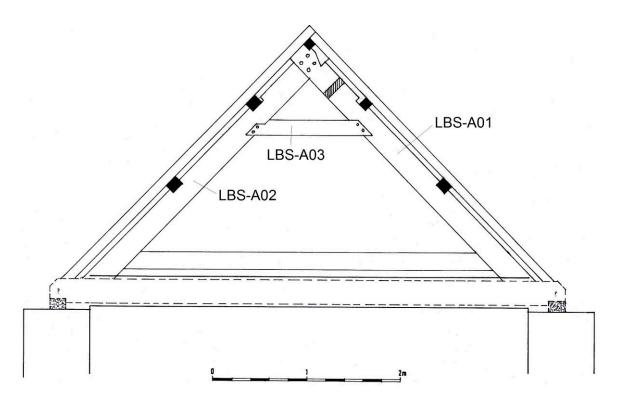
West range; truss I (east face), showing the location of samples LBS-A01–03 (Martin Roberts)
